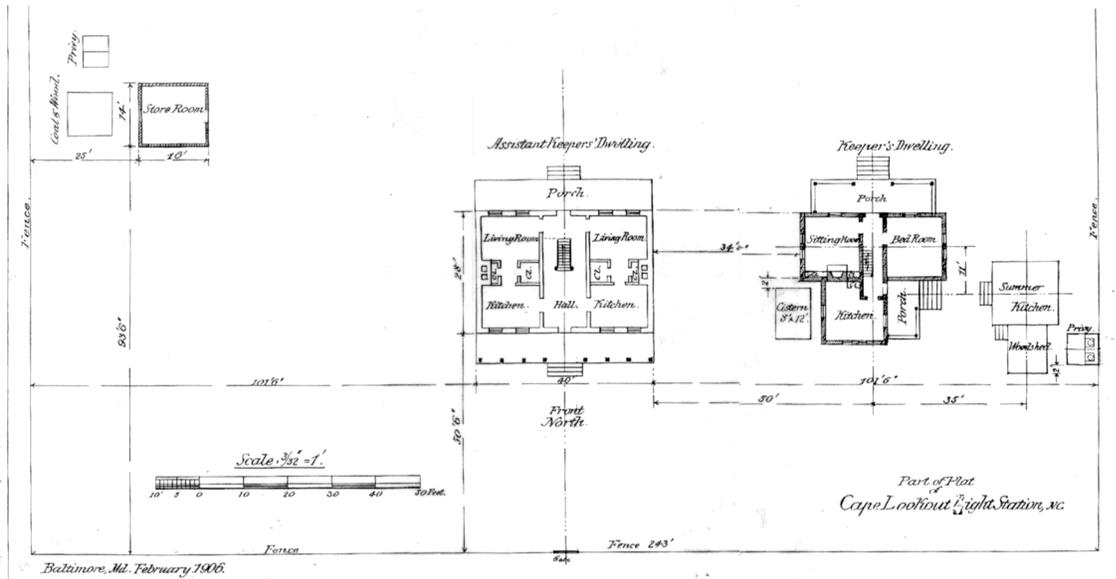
1906 site plan showing proposed location of new buildings. (U. S. Coast Guard, 1906)
